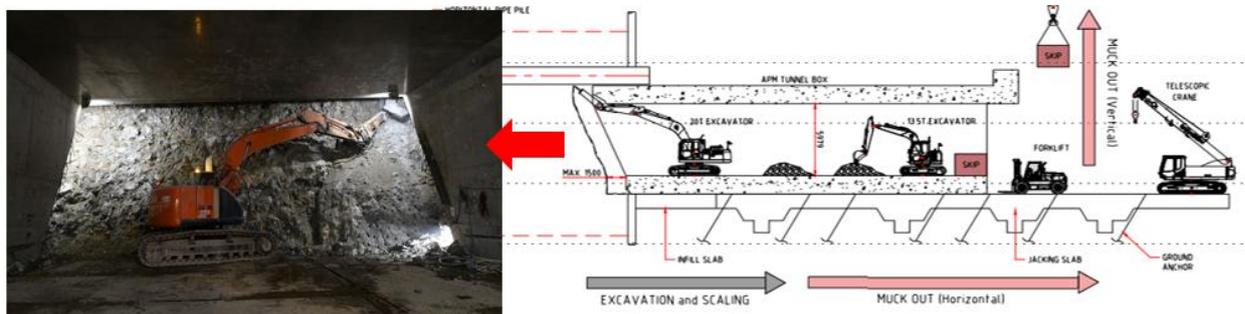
Excavation with the use of hydraulic excavator and breaker.
